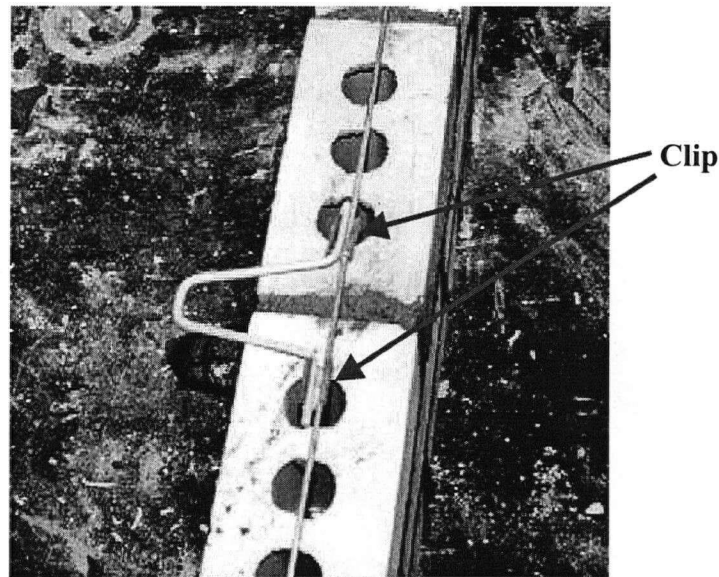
Placement of the tie with horizontal wire joint reinforcement in the bed joint.
